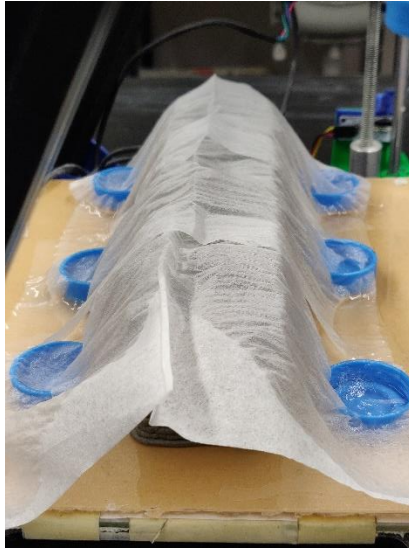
Wet paper towel applied after printing to prevent shrinkage cracking.
